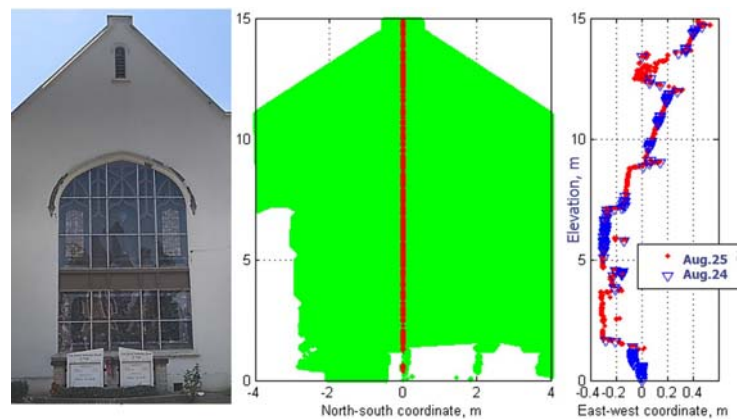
Laser scans of First United Methodist church main building, Napa, after the main shock and the aftershocks indicating no failure progression.
